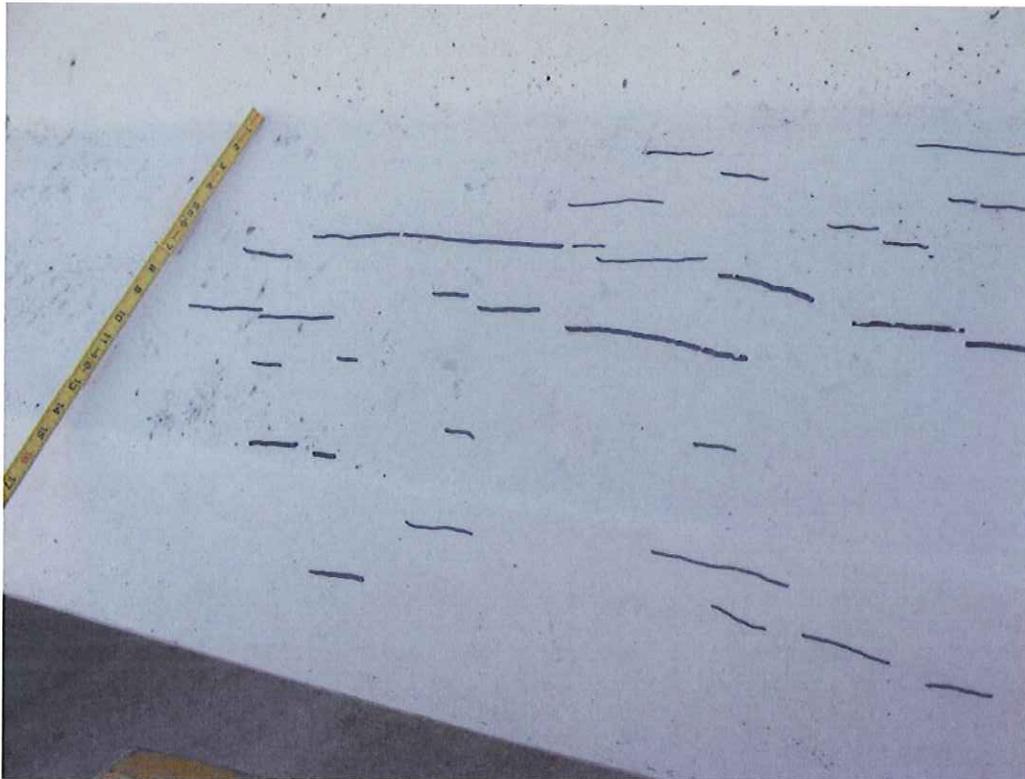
Typical longitudinal cracks in the bottom flanges of the exterior faces
